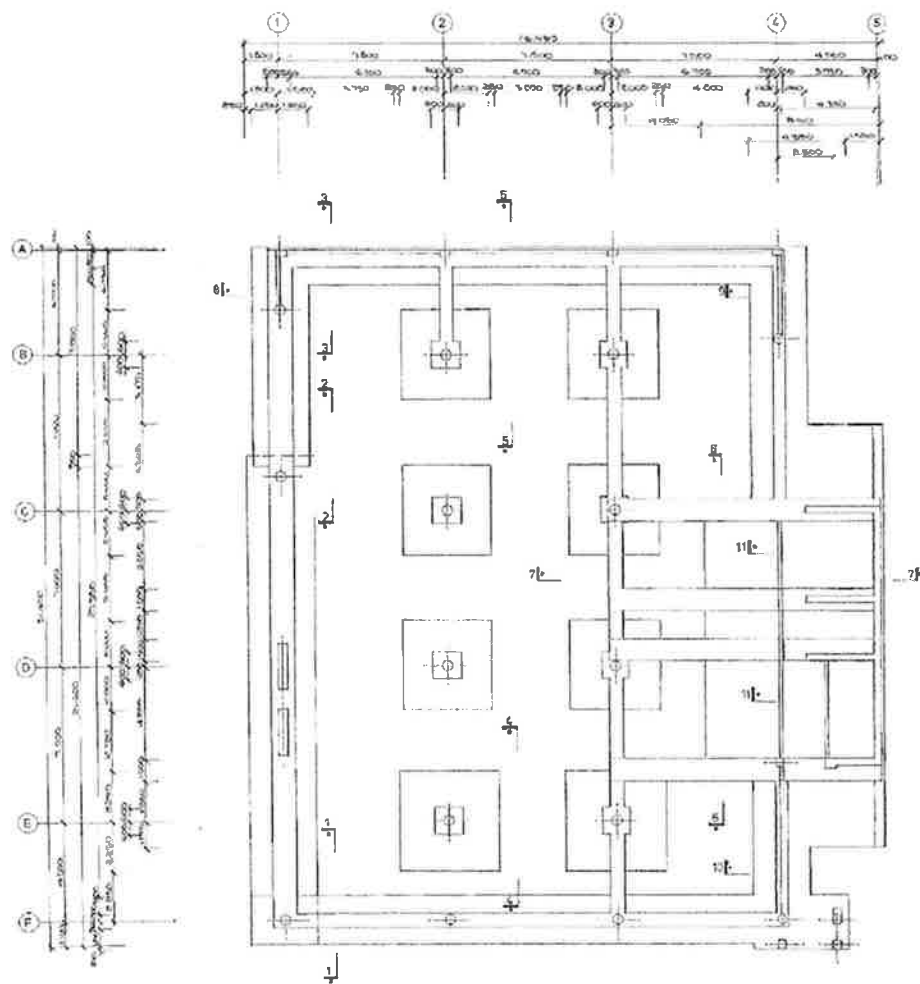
Foundation Layout (Extract from DENG Dwg S2)
